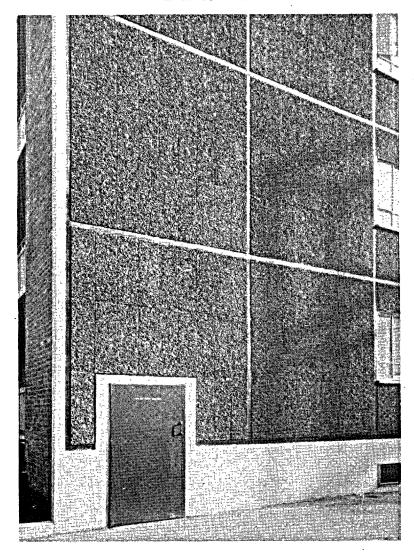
Precast concrete facing slabs with exposed brick aggregate surface on flats in London for Holborn Metropolitan Borough Council.
